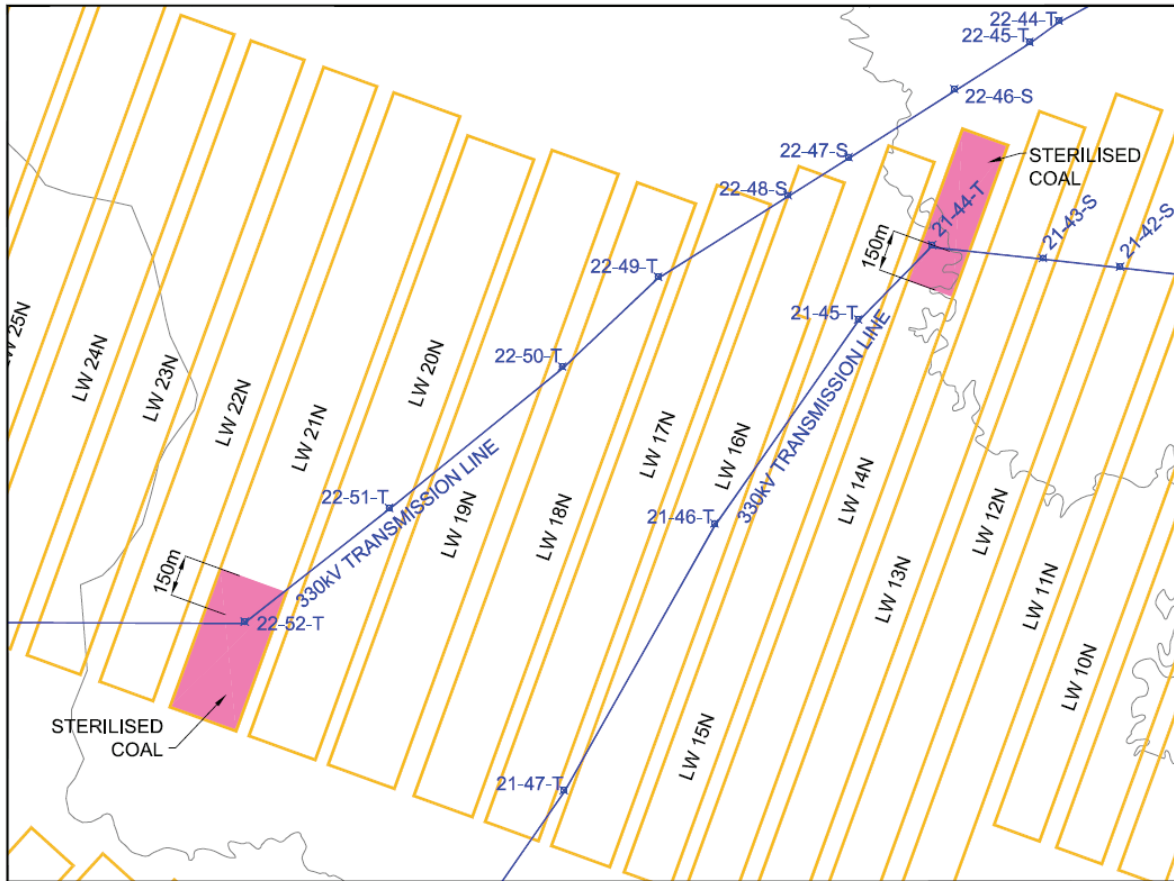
Plan showing potential coal sterilisation if no preventative works are undertaken at the two high angled tension towers labelled Tower 21-44-T and Tower 22-52-T
